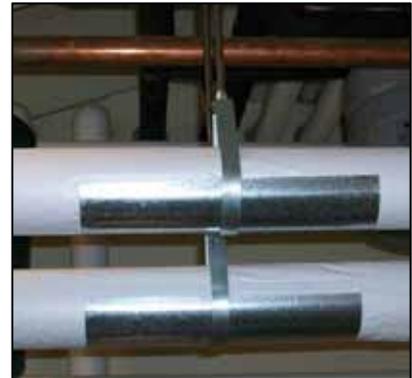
Clevis hanger with bearing strip to protect pipe insulation
